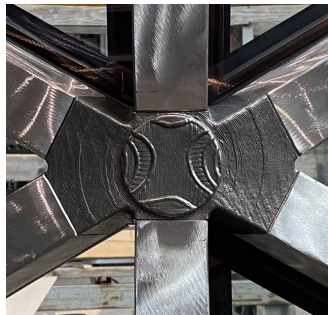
DED-L node in first full-scale mock-up assembly (Image courtesy of Jansen AG)
